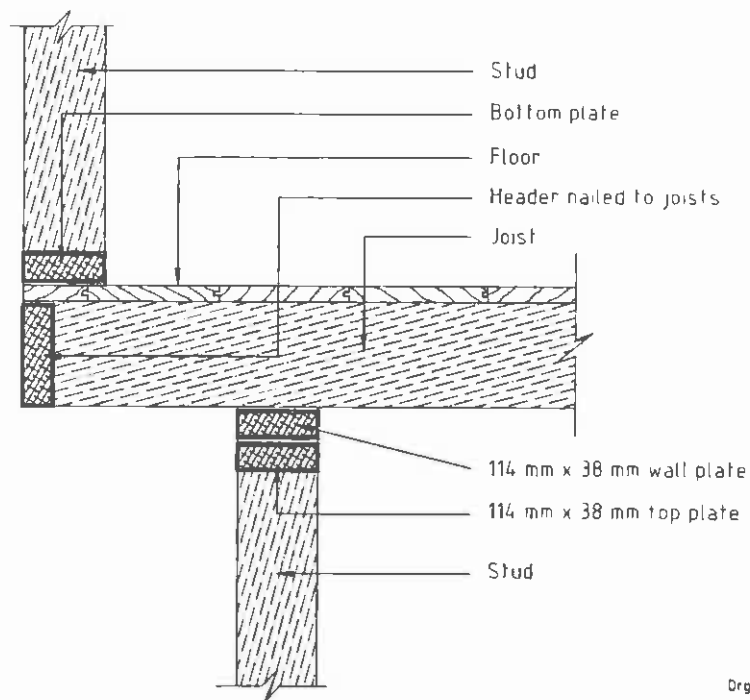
Overhang of external wall at first floor with joists at right angles to wall below
